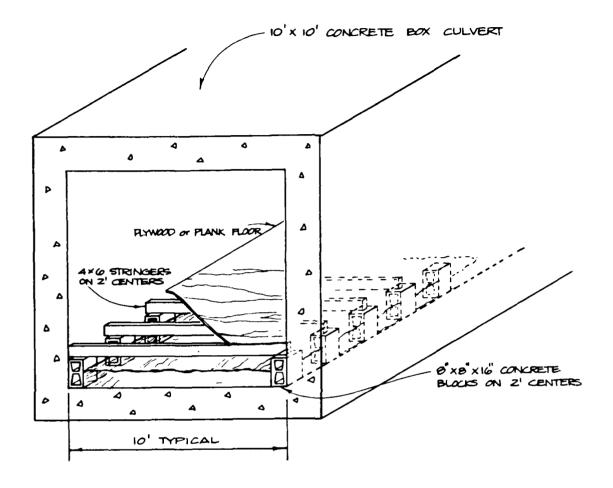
Box Culvert Key Worker Shelter With Low-Flow False Floor.
